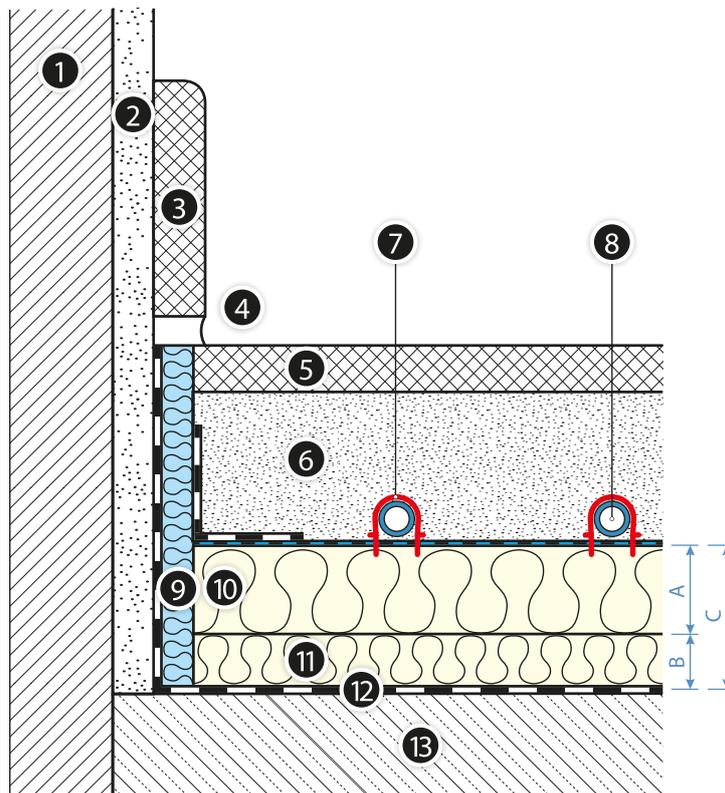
Floor heater with KAN-therm Tacker System board and supplementary insulation and damp-proof coating on the ceiling laid out on the ground
